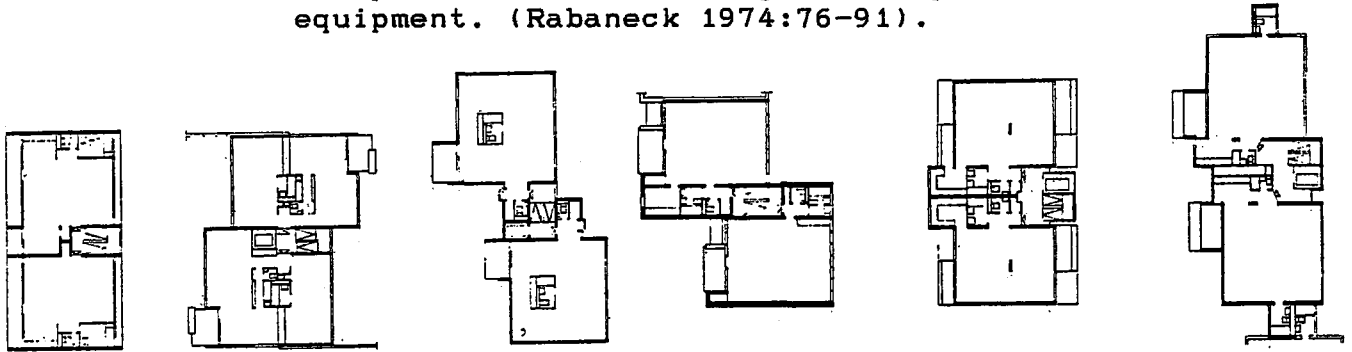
Flexible Residential Floorplans' competition in 1971. Plans of the six award winning schemes.
